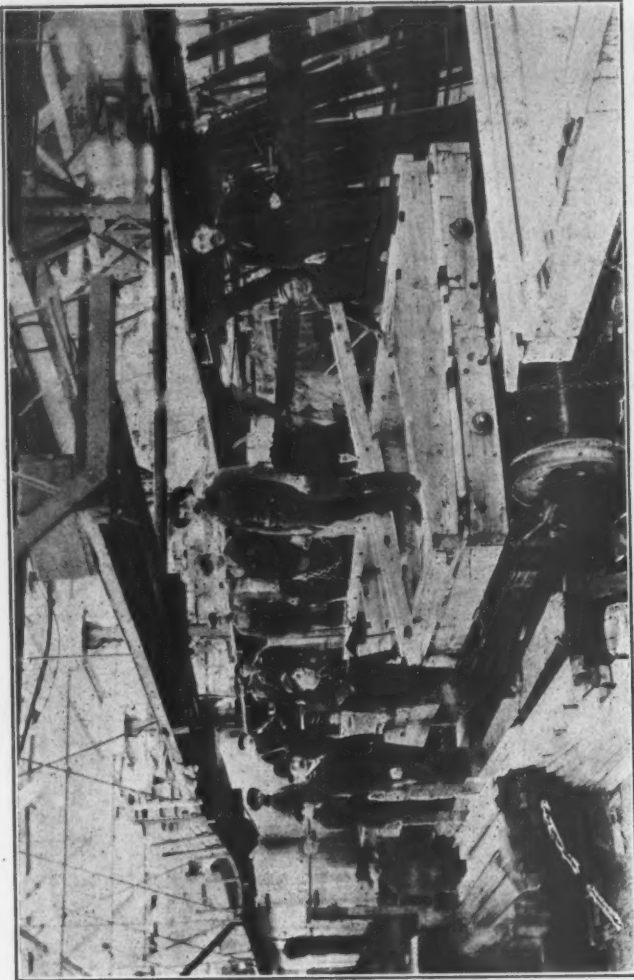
FOURTH STAGE—THE ROOF FRAME IS ABOUT TO BE RAISED.
